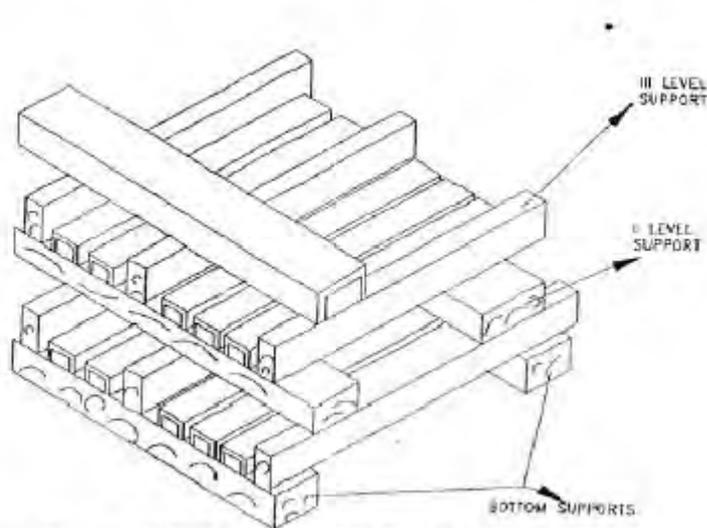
STRUCTURAL STEEL STACKING ARRANGEMENT
